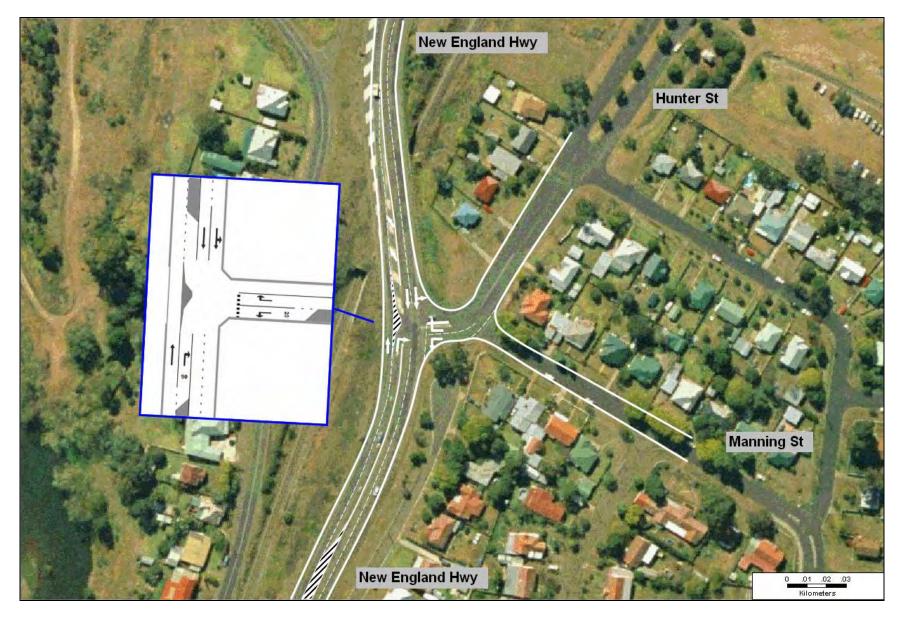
Seagull type arrangement at New England Hwy/Hunter Street
